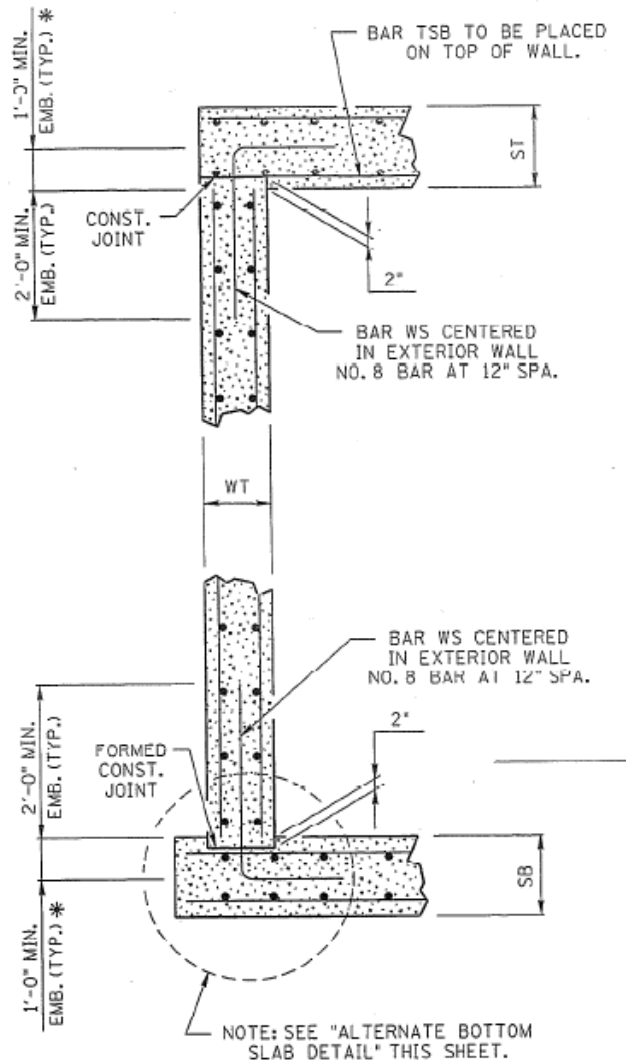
TDOT Construction Joints between Slabs and Exterior Walls (TDOT 2000c)
